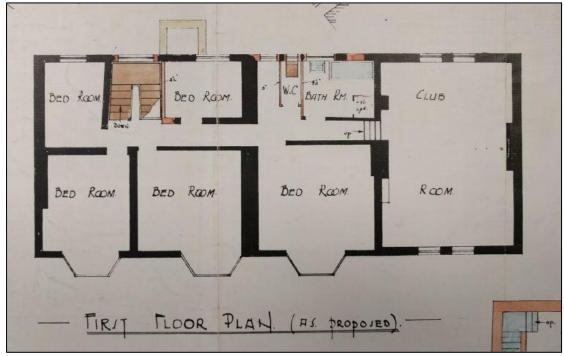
First floor plan proposed 1937 (LRO PSBL/20/147)
